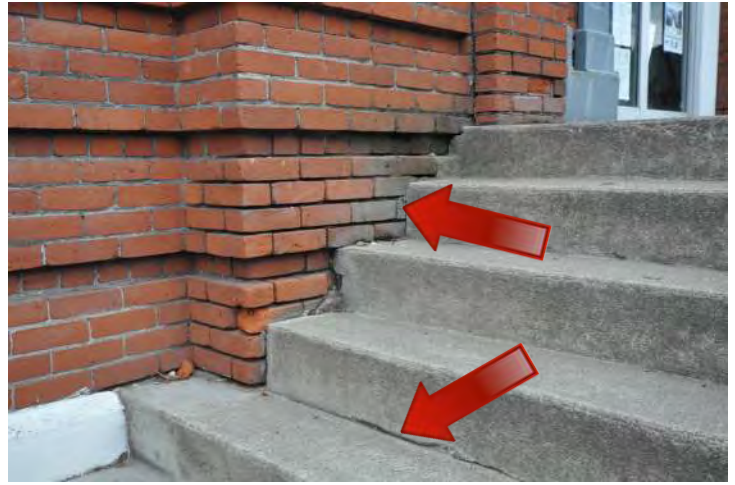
As noted in the caption for Figure 19 & 21, there are significant issues with the masonry wall system at the north main entry stair. In addition, concrete deterioration is observed in the form of cracks at the joint between the riser and tread of the bottom step, which allows entry of water into the system and can lead to accelerated freeze/thaw deterioration.
